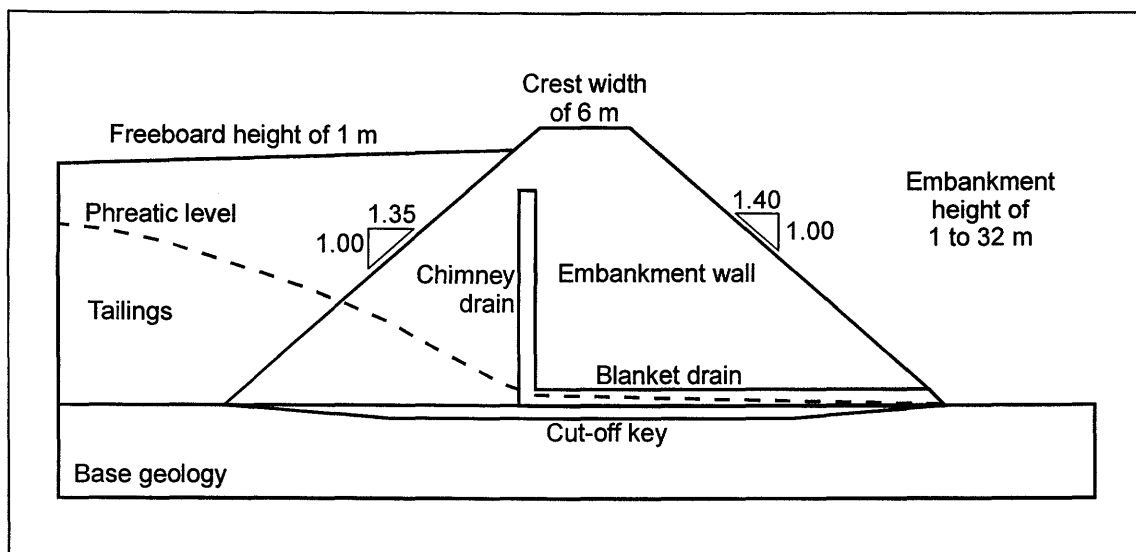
Schematic of the typical Kidston tailings impoundment embankment wall cross-section at any location along the impoundment perimeter.
